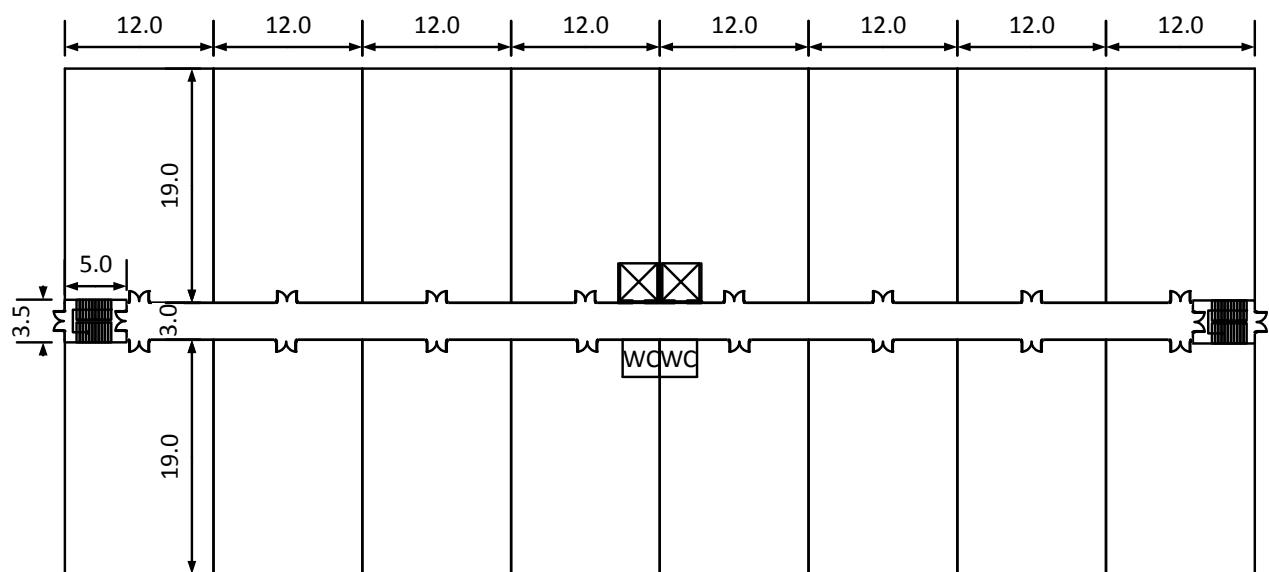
Layout of the large-area (3,936 m²) office buildings
